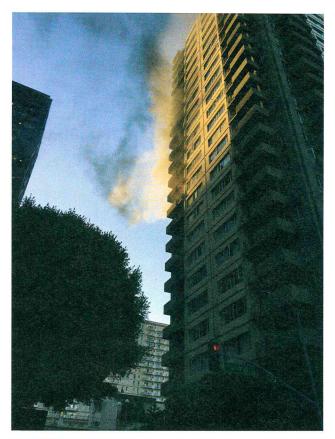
The Gateway fire started in a corner unit on floor 12 and burned every corner unit above it to the sixteenth floor.
